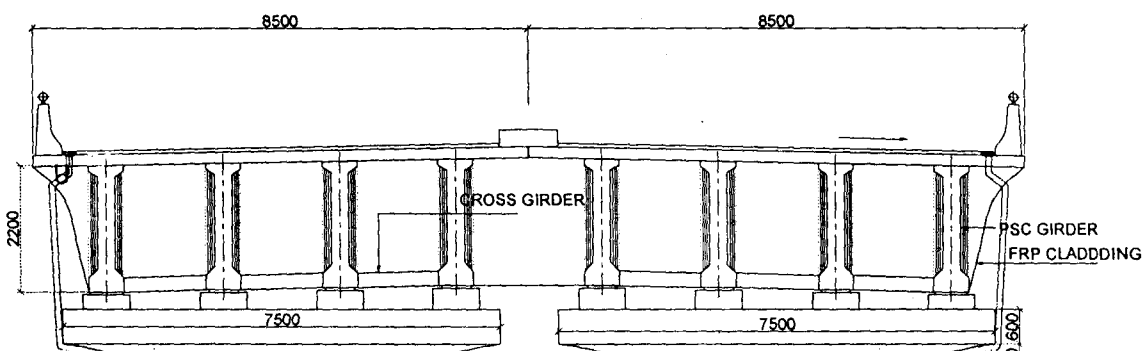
Typical cross section with Post tensioned girders for 4-lane deck
